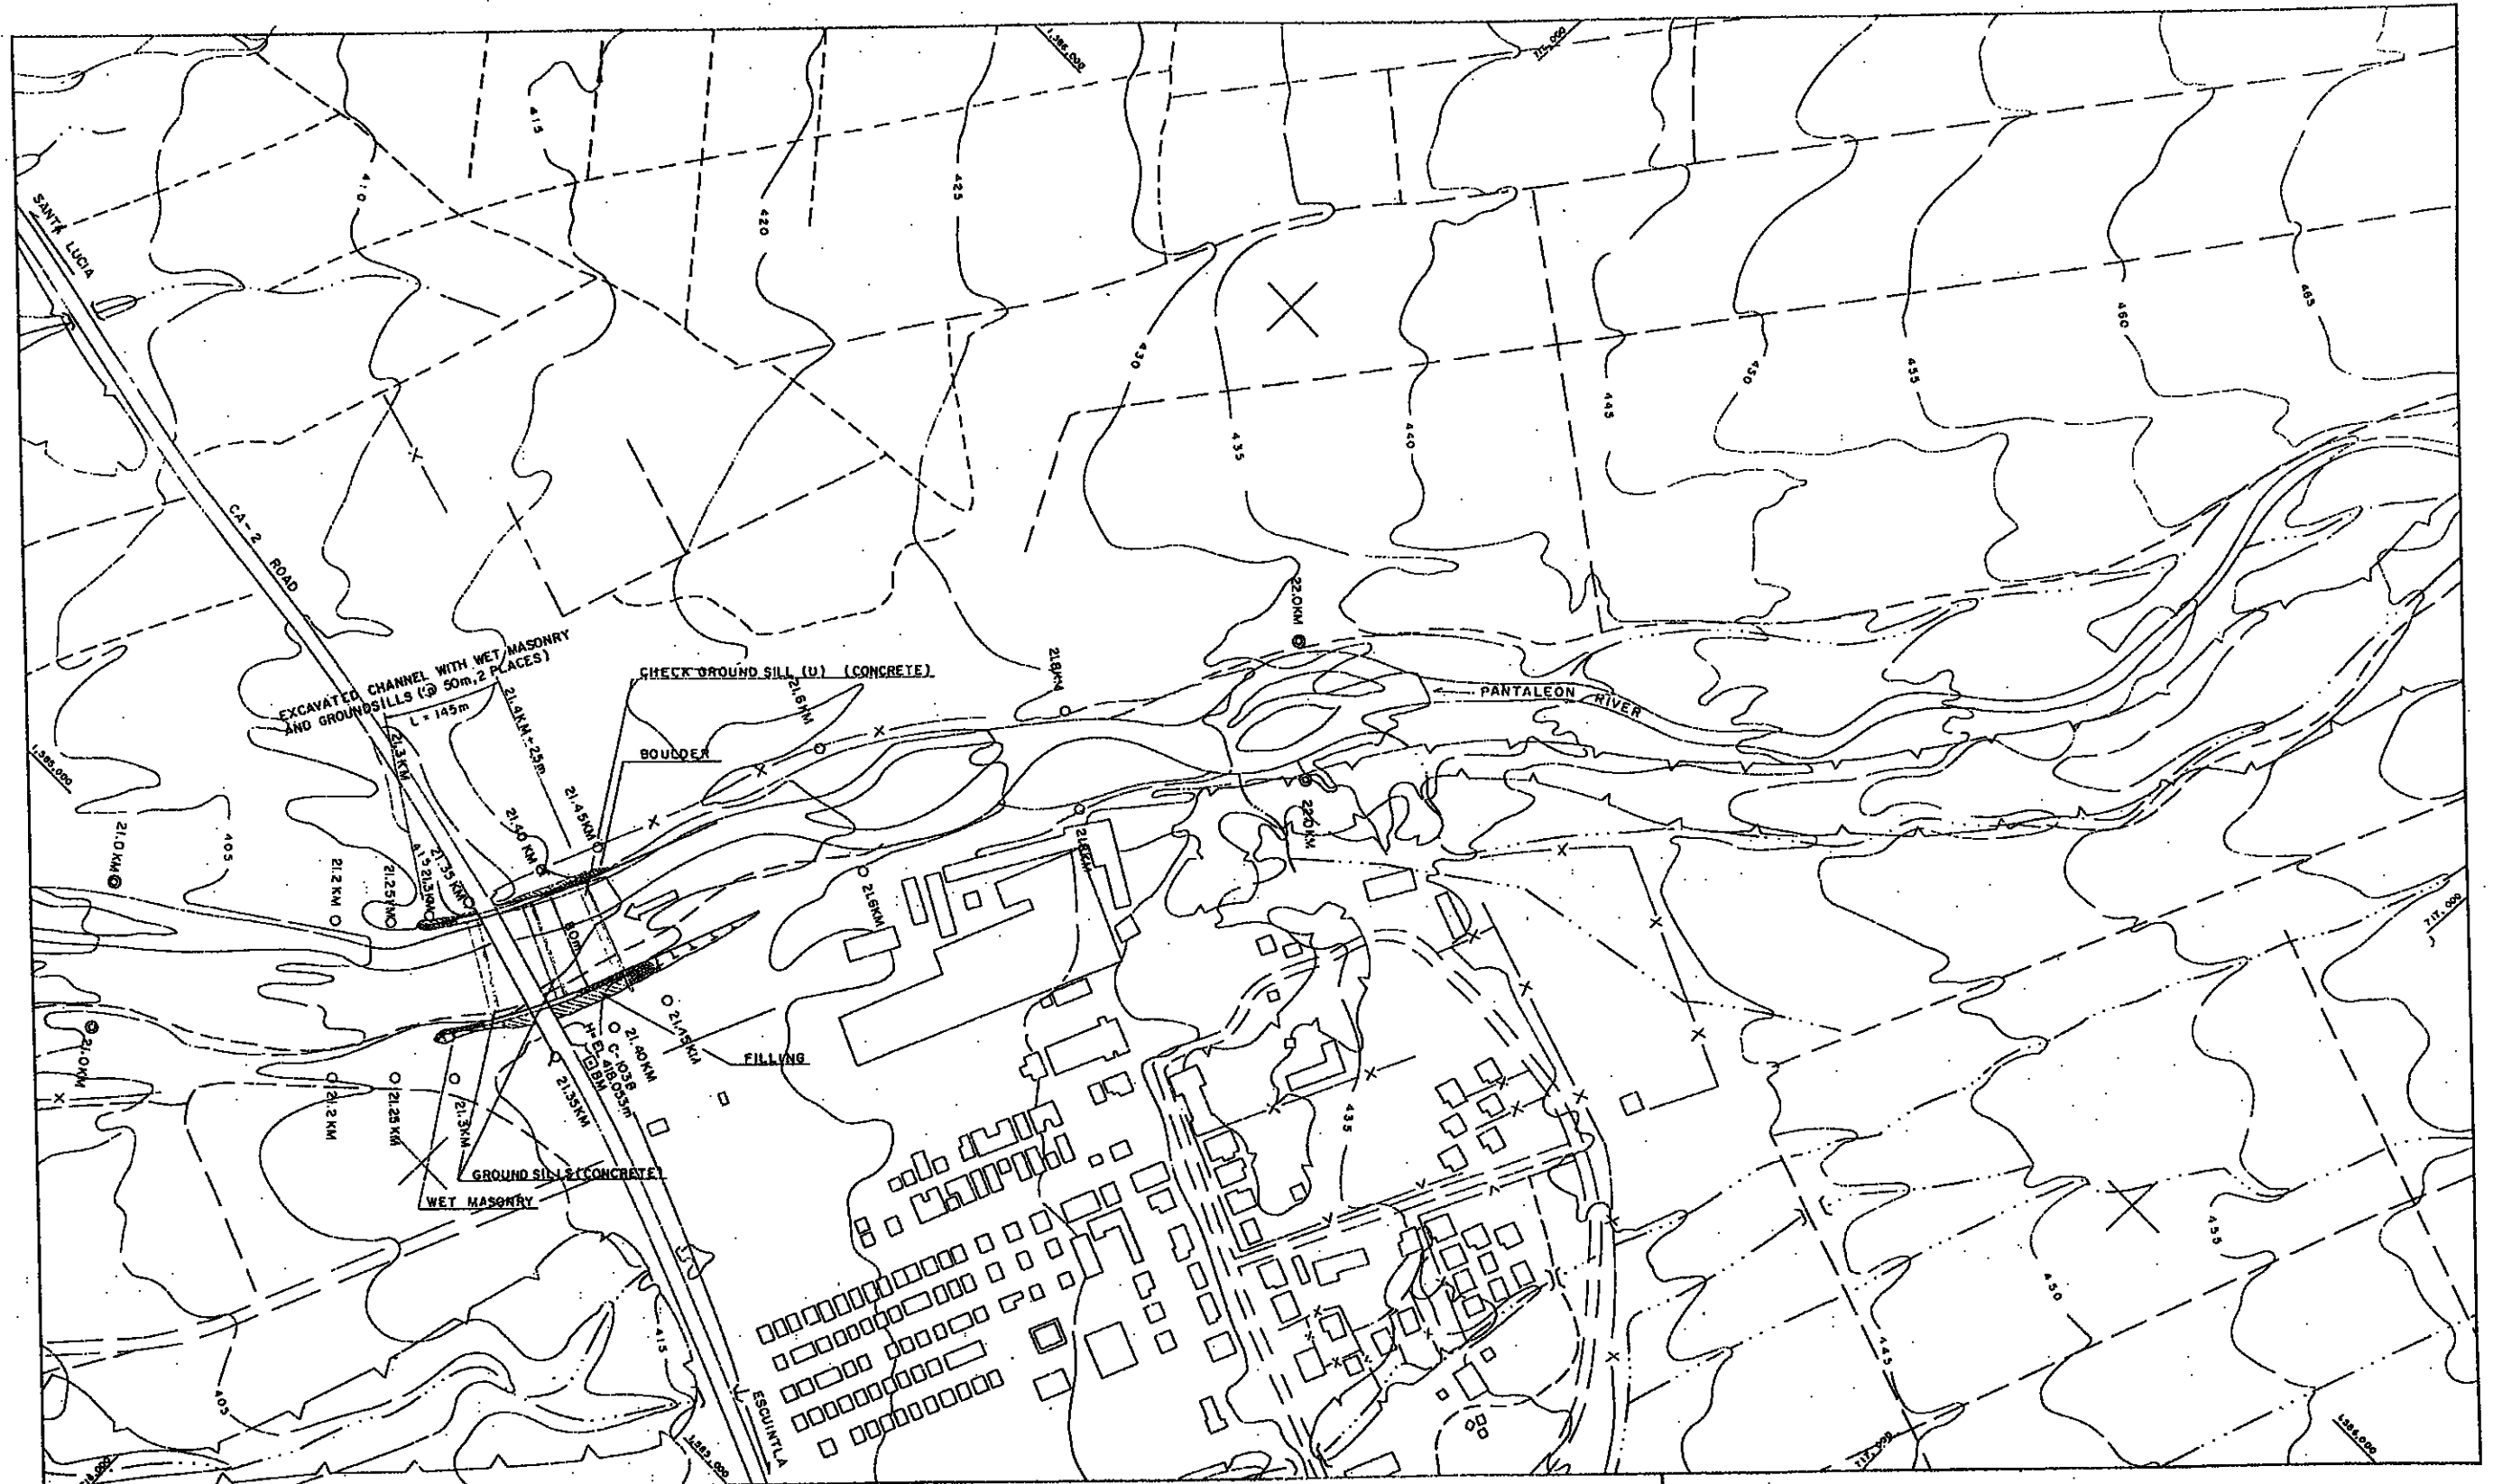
(5/6) PLAN OF RIVER IMPROVEMENT IN THE PROPOSED URGENT PLAN (PANTALEON RIVER)
